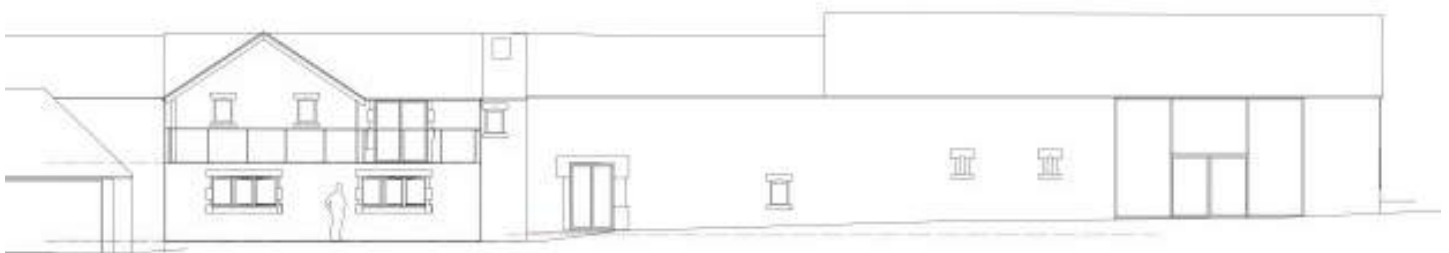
(top) - Proposed south elevation of the historic barns (#7 + #8)
